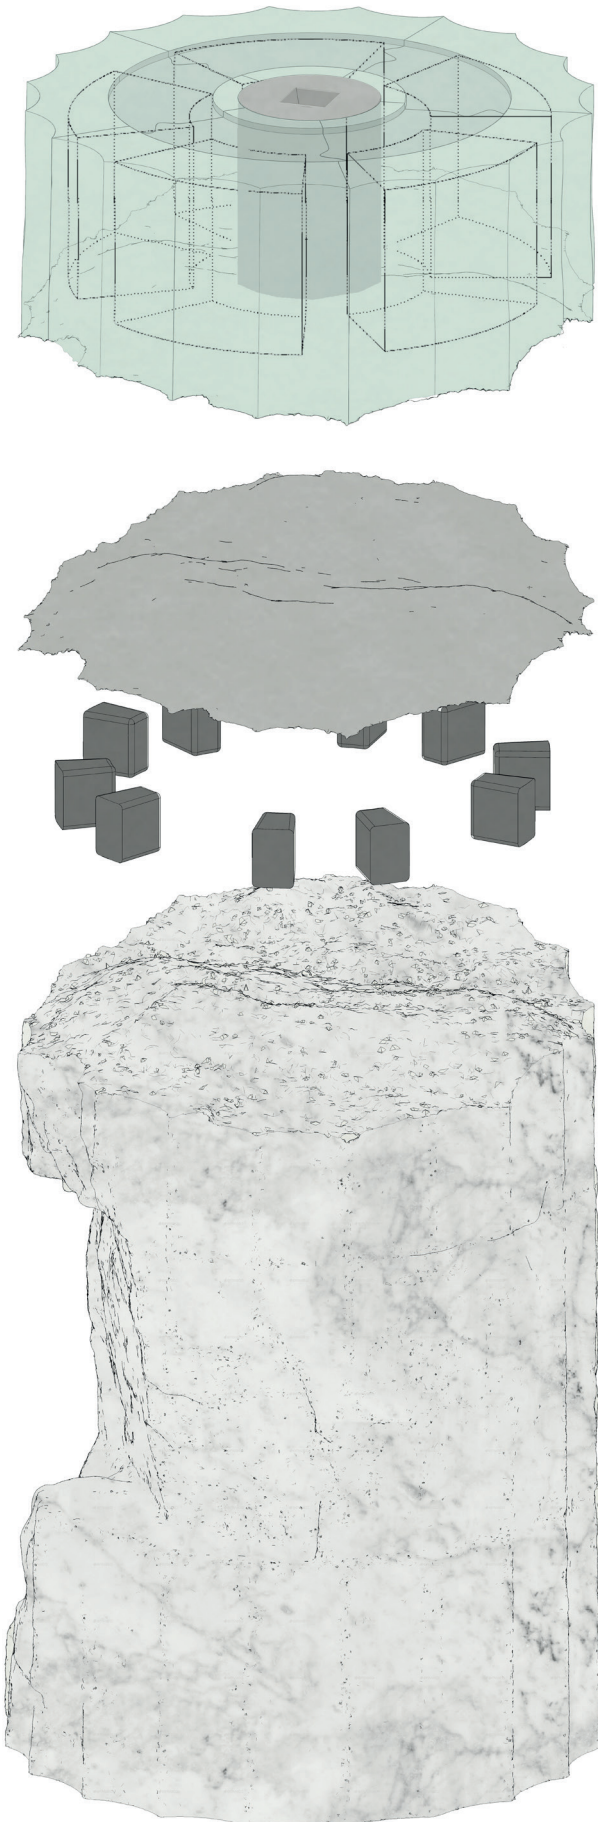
Exploded view of the connection between the broken marble and fitting glass element
